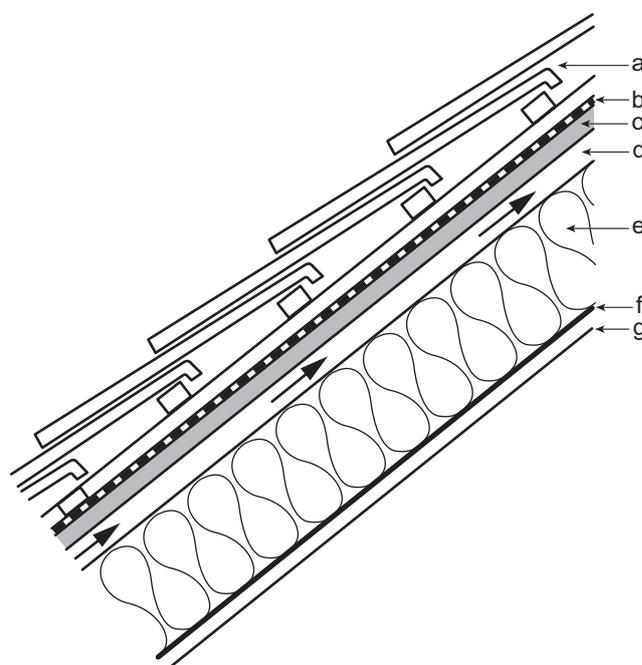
Example of a warm roof with sloping ceiling and insulation between rafters. There must be adequate ventilation above the insulation
